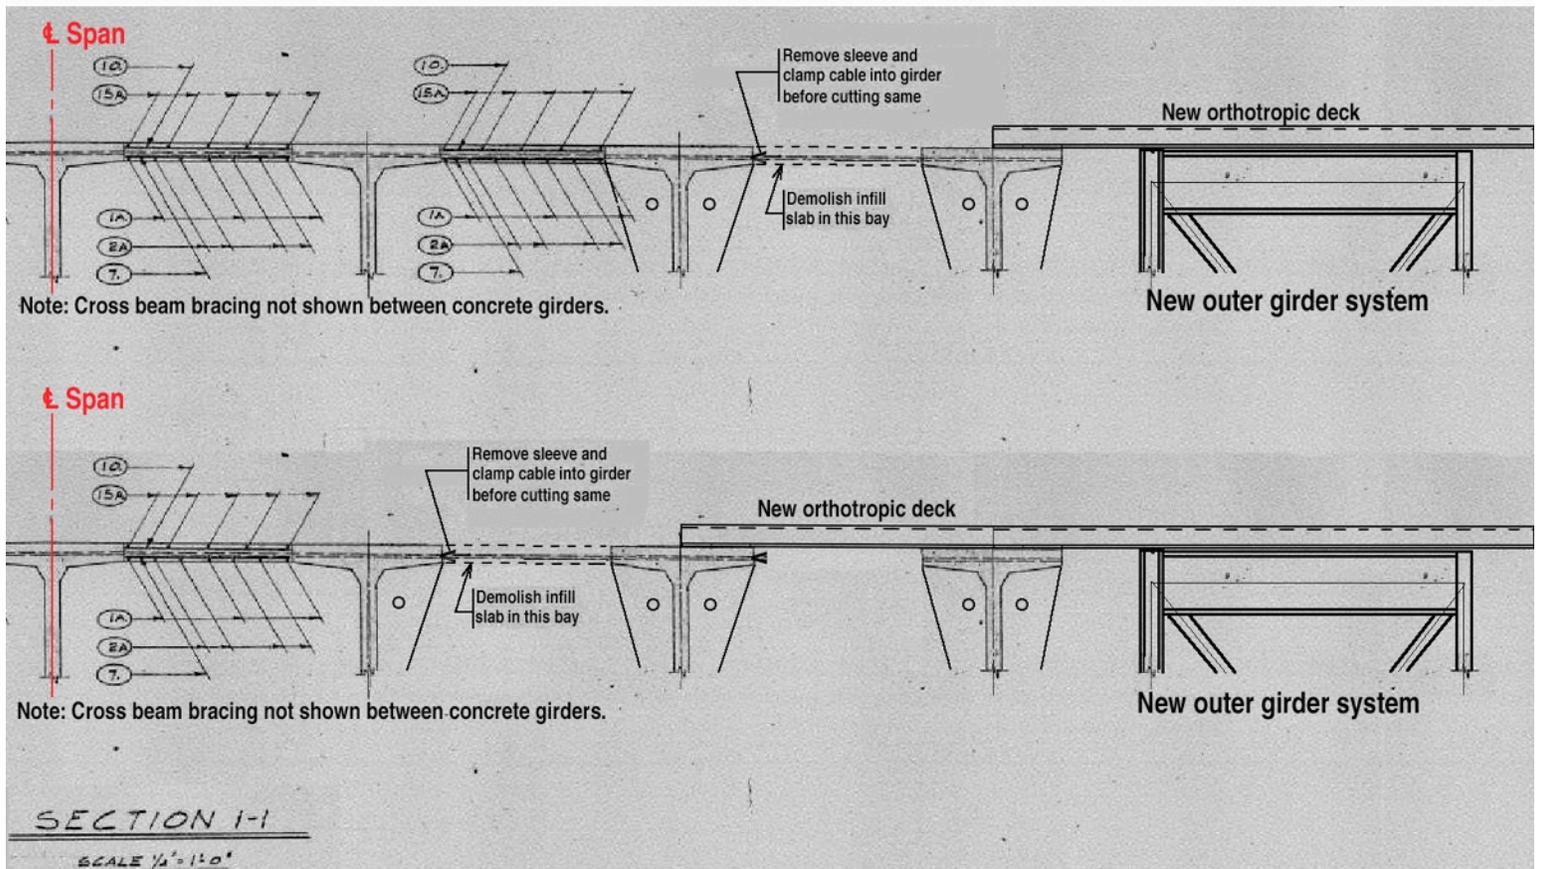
Sequencing for replacement of infill slabs between main concrete girders
